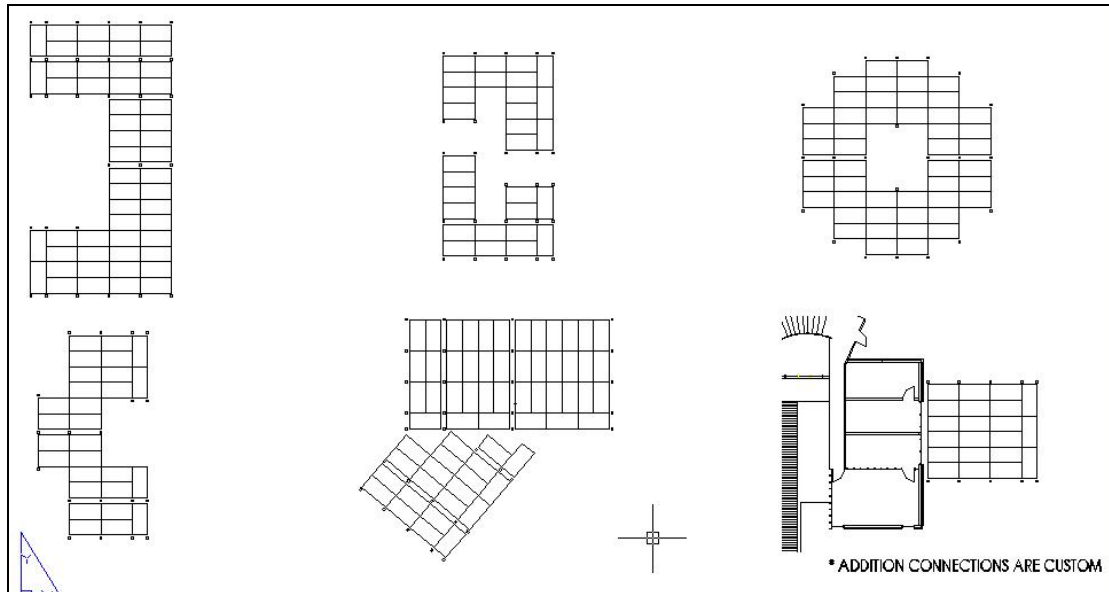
Some Possible Plan Layouts; interface between system and existing structure in an addition would be custom.
